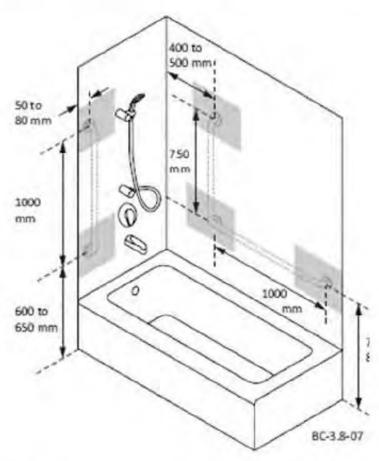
Adaptable Dwelling Unit Bathrooms
